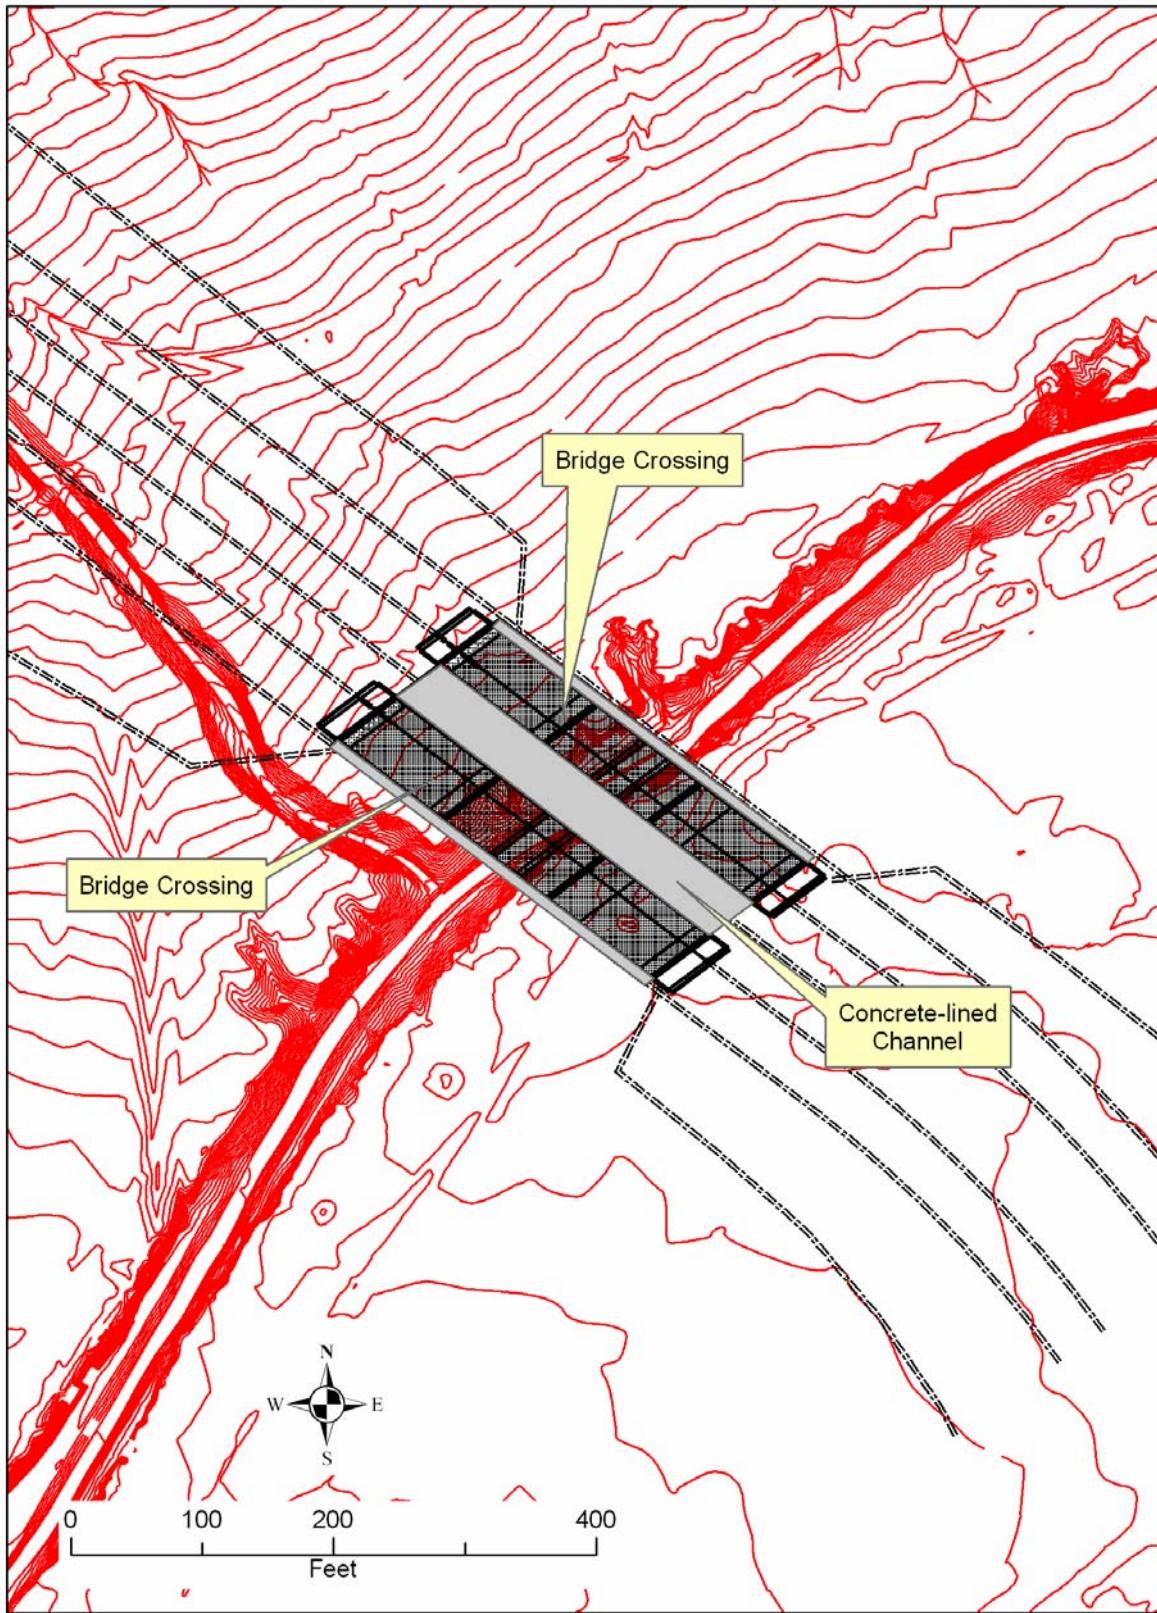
Plan view of proposed University Boulevard bridge crossing of Tijeras Arroyo.
